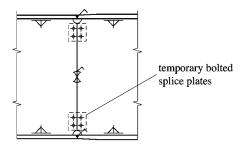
Site welded joint with temporary bolted splice plates.
